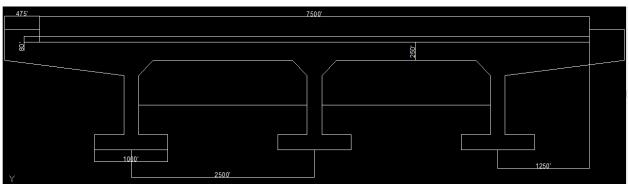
RCC I GIRDER TRANSVERSE SECTION
